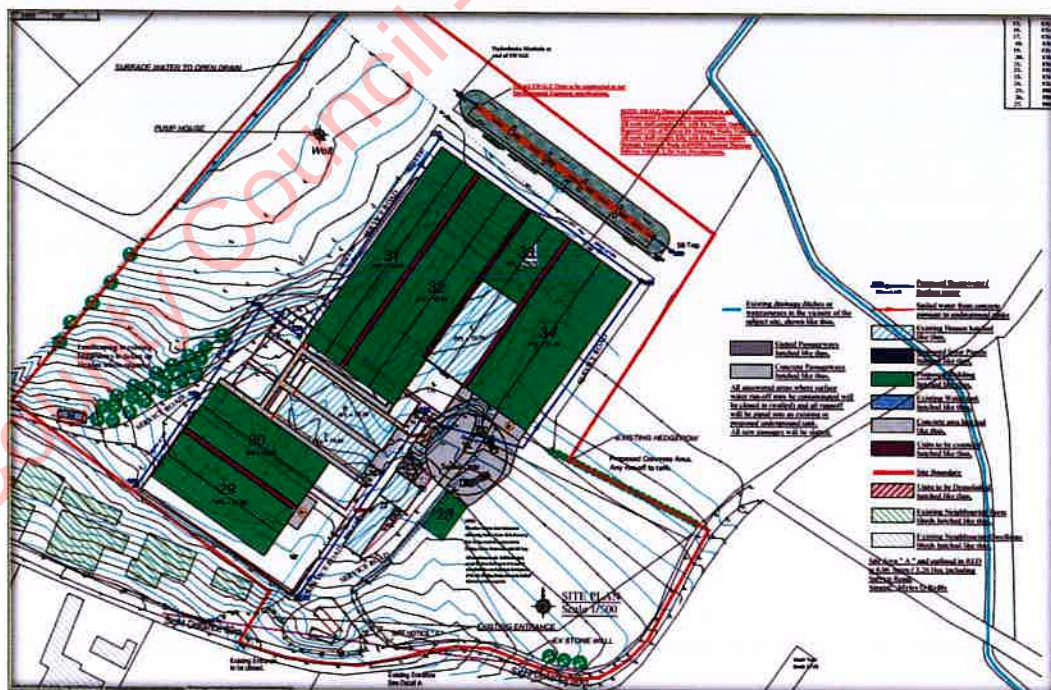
Proposed Site Plan (M O'Reilly Civil Engineering)
